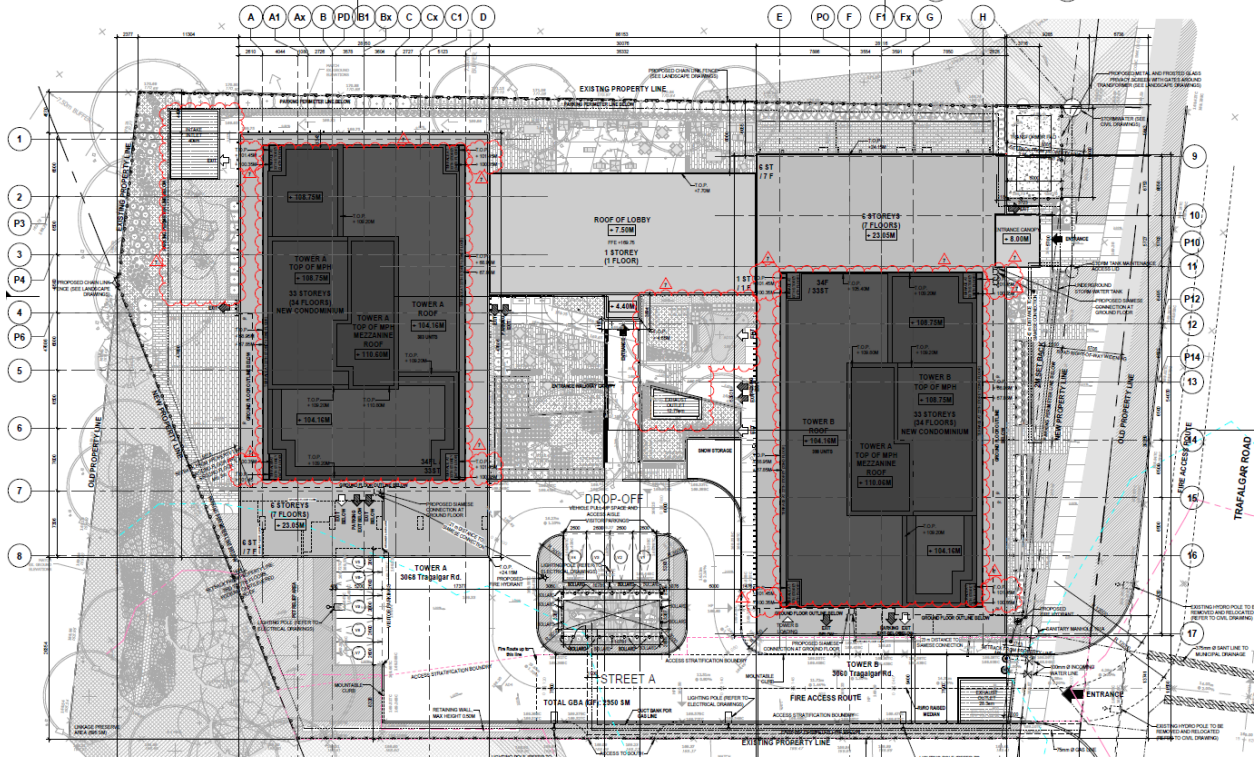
B: CONCEPTUAL LANDSCAPE PLAN
